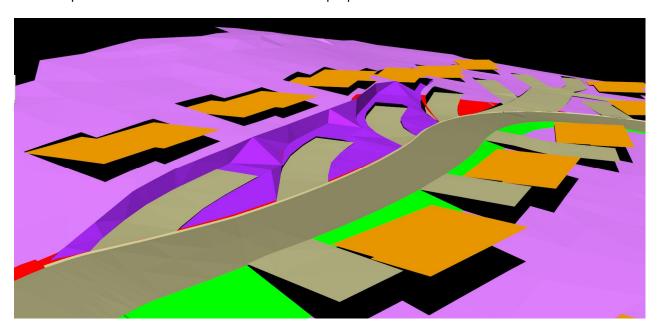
Schematic 3D site model, showing batters between the unit driveways and the access driveway
